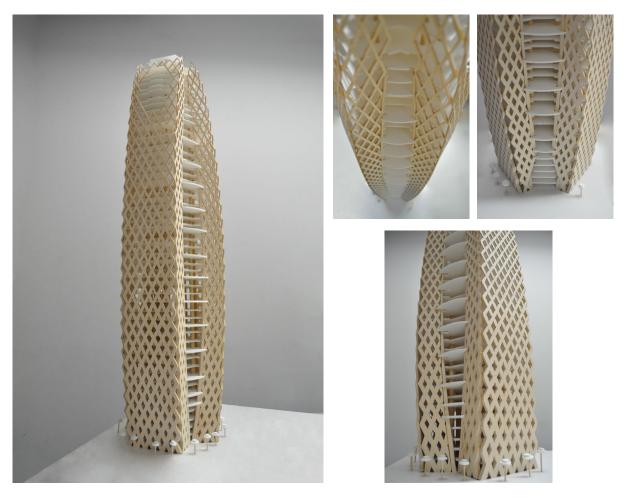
n - 7.2.q – Constructional model of the timber cocoon tower (built in scale 1:200)
